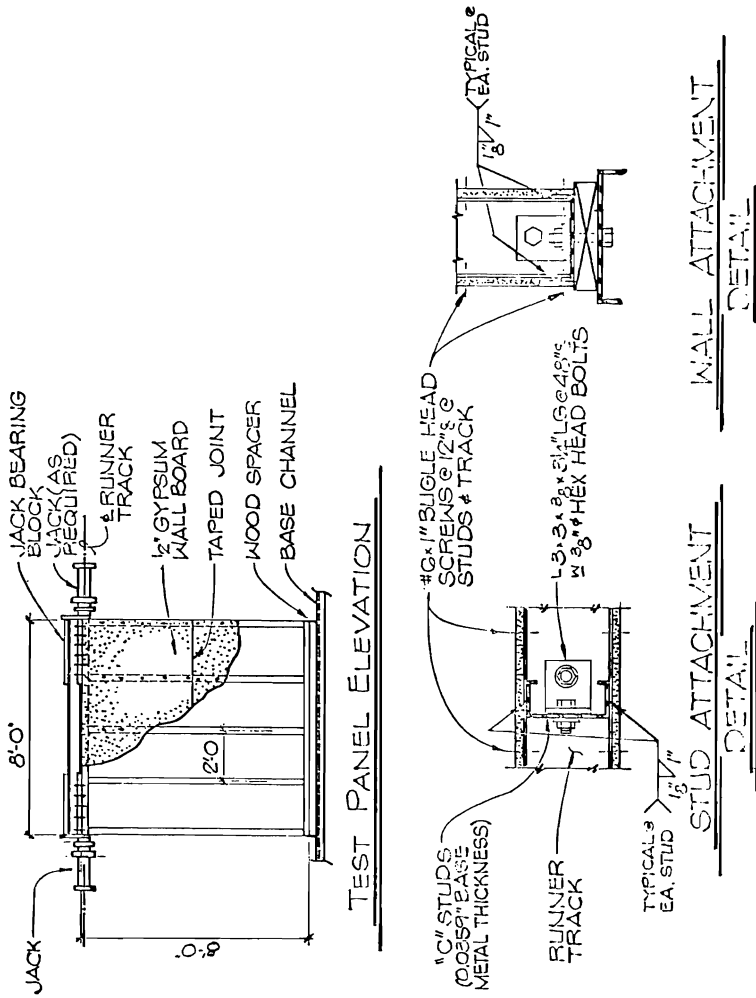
Test Assembly Plan & Details - Wall Type "L"
